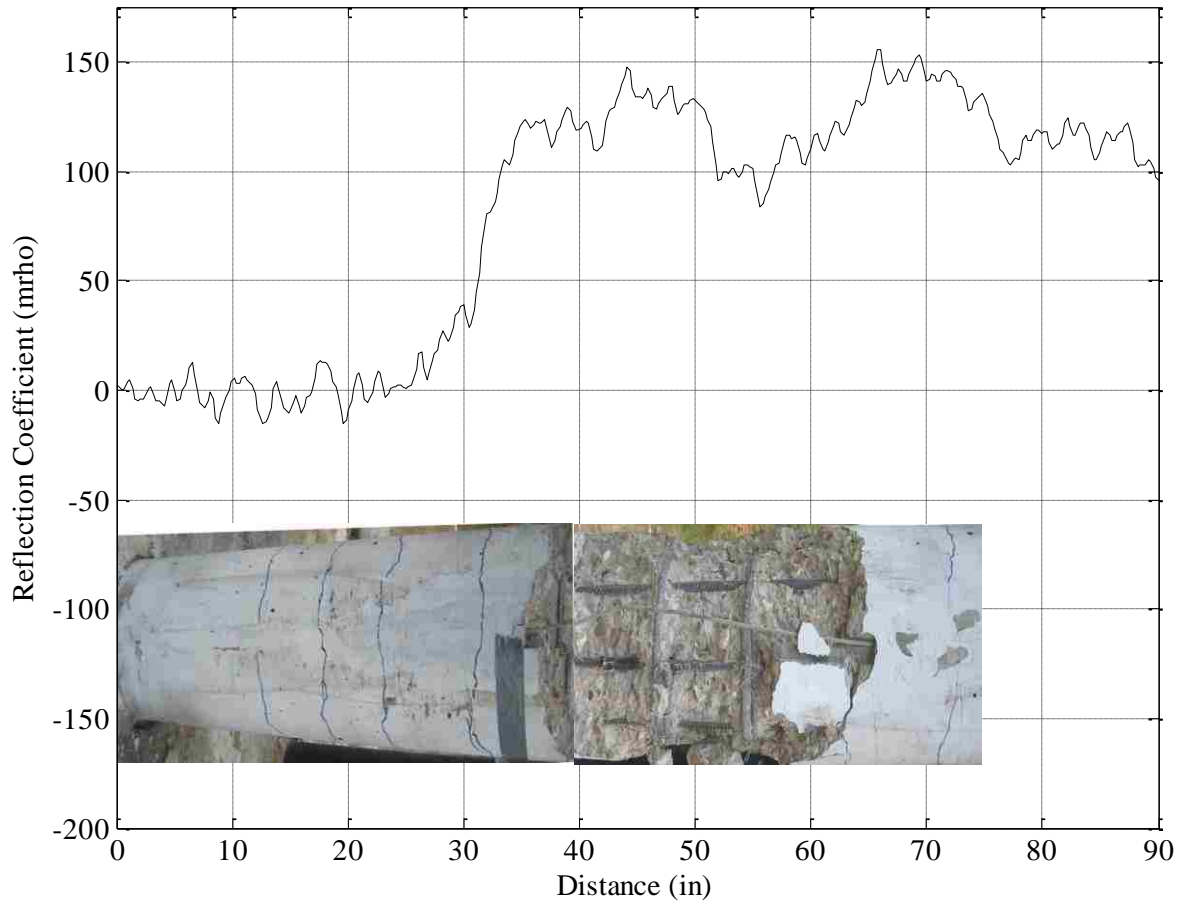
Column 1 10 lbs Crack Sensor Signal Compared to Picture of Cracking
